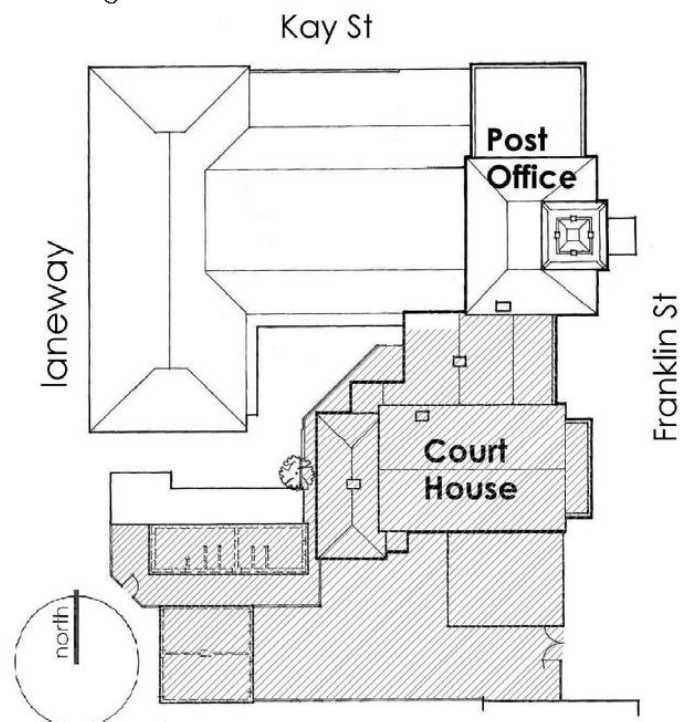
As Existing Public Offices Plan, Court House portion shaded
